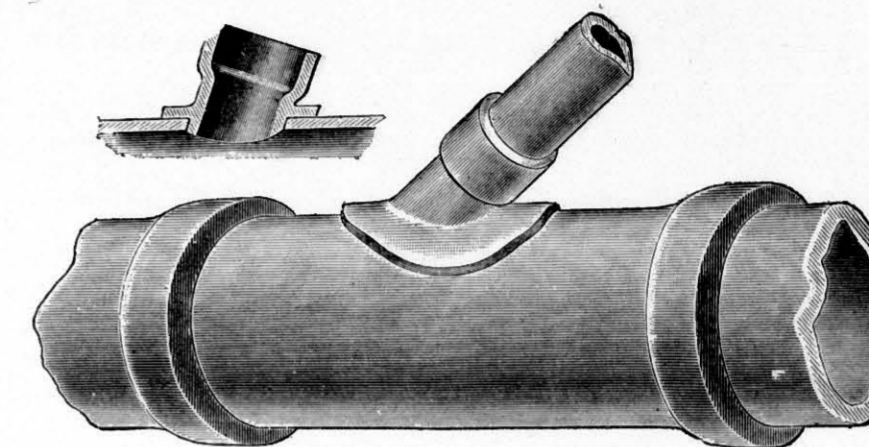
Section and Plan of Saddle-junction for Branch-drain.
